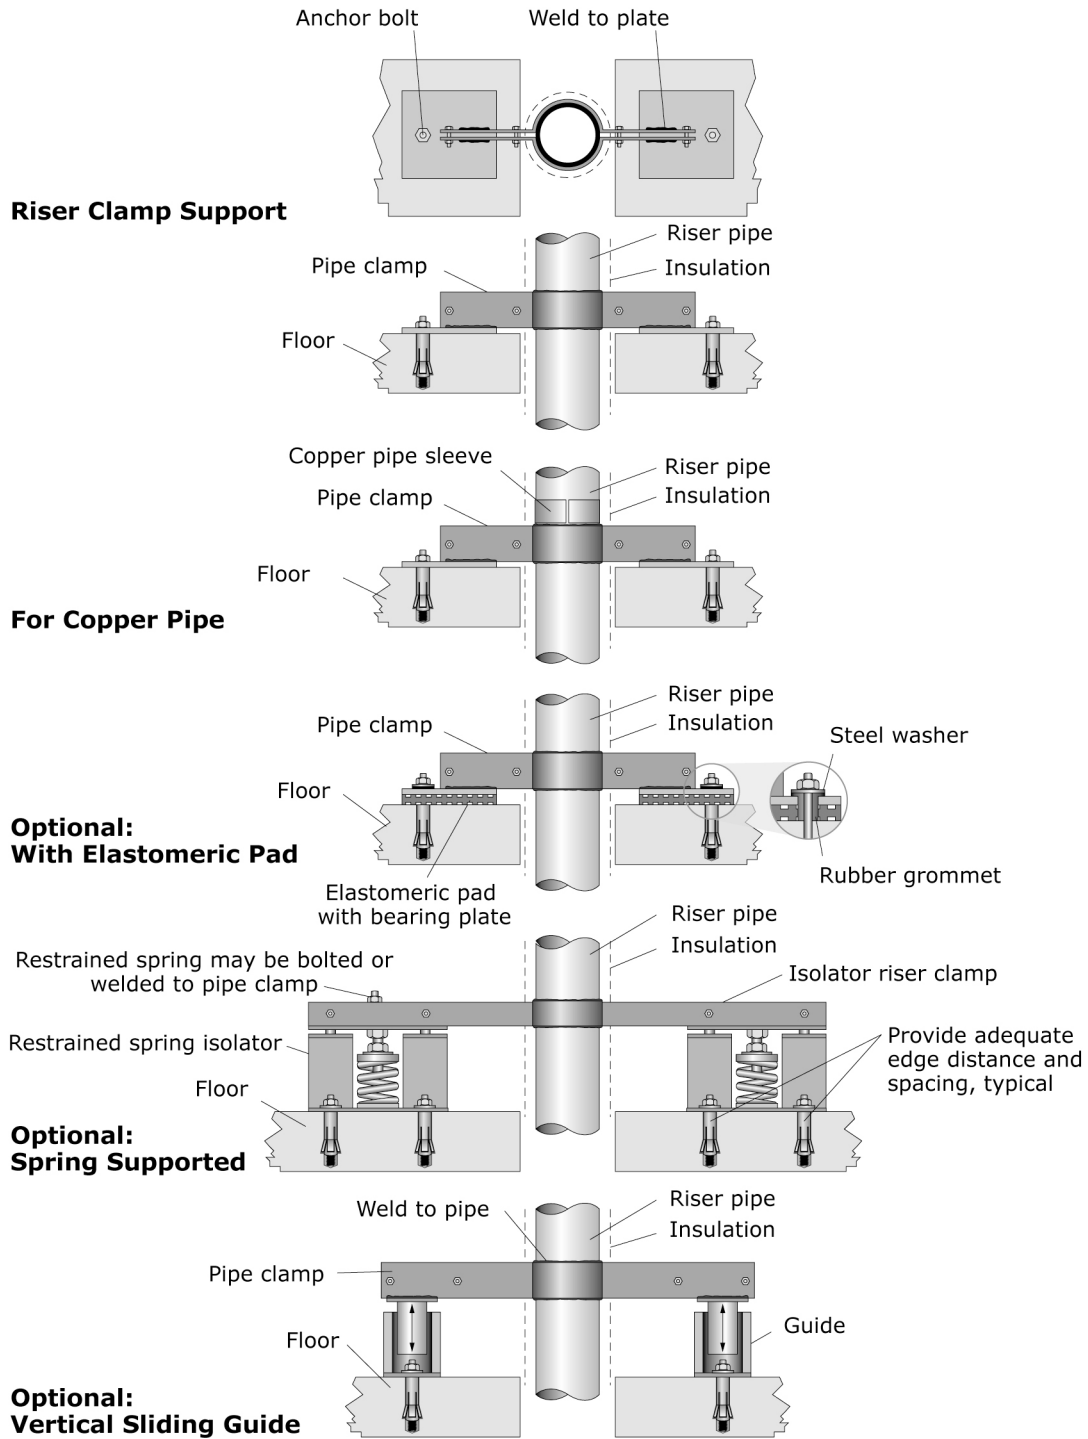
Riser restraint/support at floor penetrations – variations with pipe clamp, vibration isolation, and sliding guides (ER).
